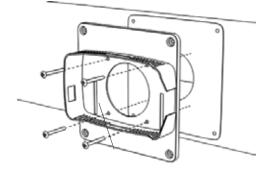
(b) *NOTE: Use 4 inside pre-cut holes for duct board
